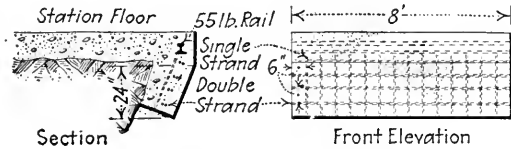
CONCRETE STATION BROW REINFORCED.
